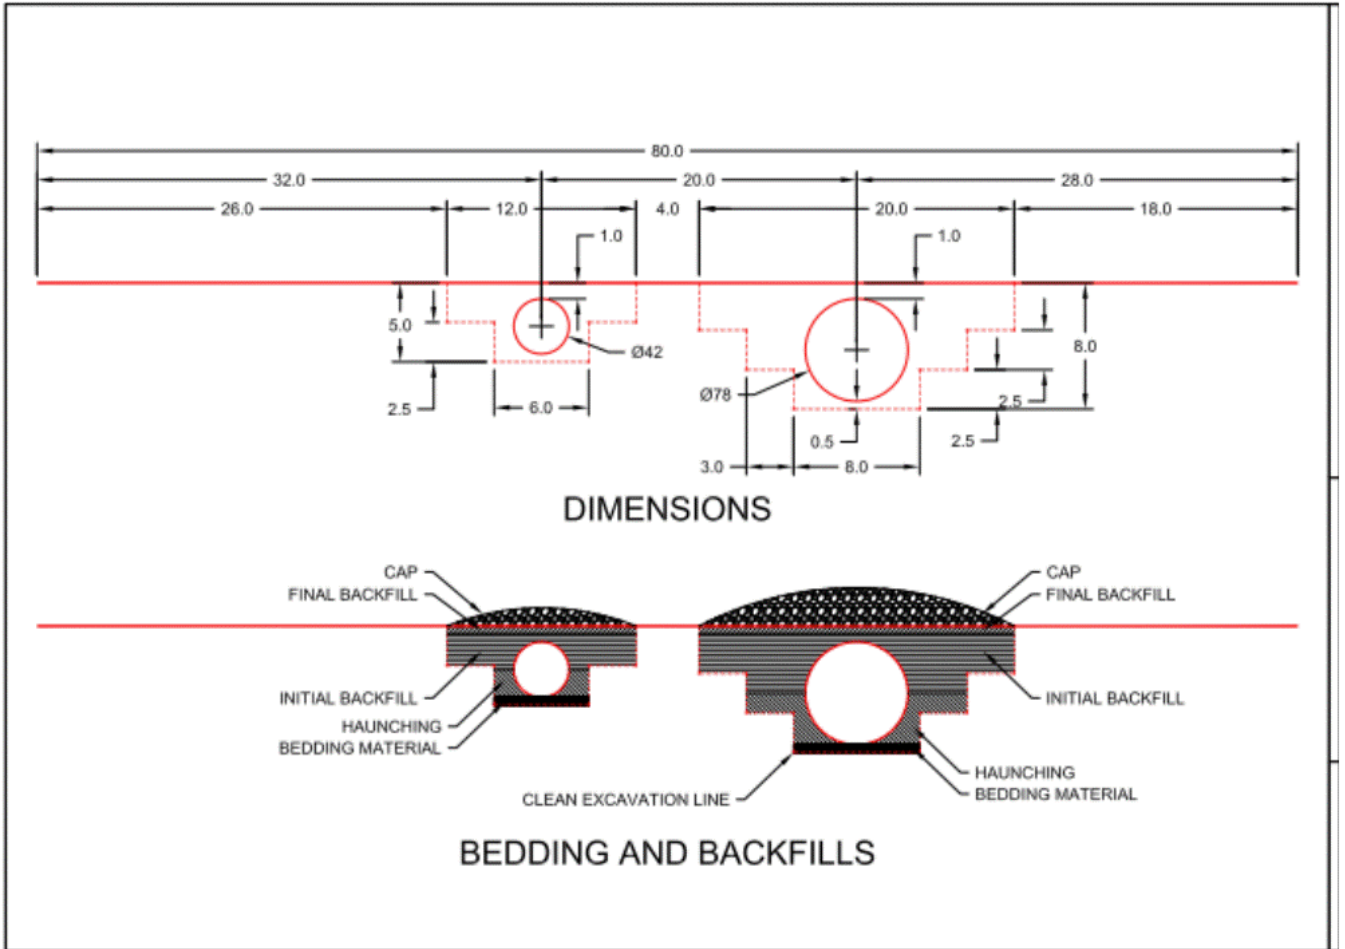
Proposed pipe trench cross-sections. The trenches would be backfilled using clean material and compacted. The excavated side-cast material would be placed over top to complete the filling of the trench and create a cap over the pipe.
